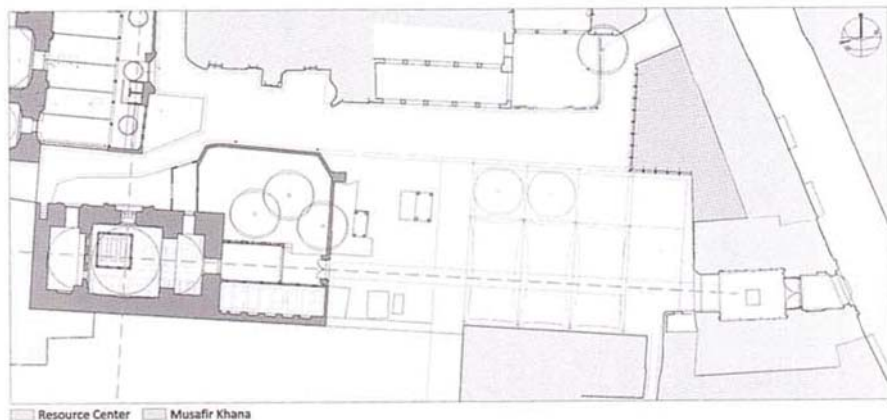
Musa Pak Courtyard design: planimetric drawing
